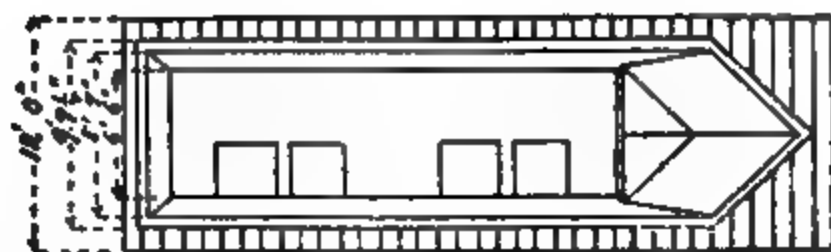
PIER OF ST. CROIX RIVER BRIDGE.
